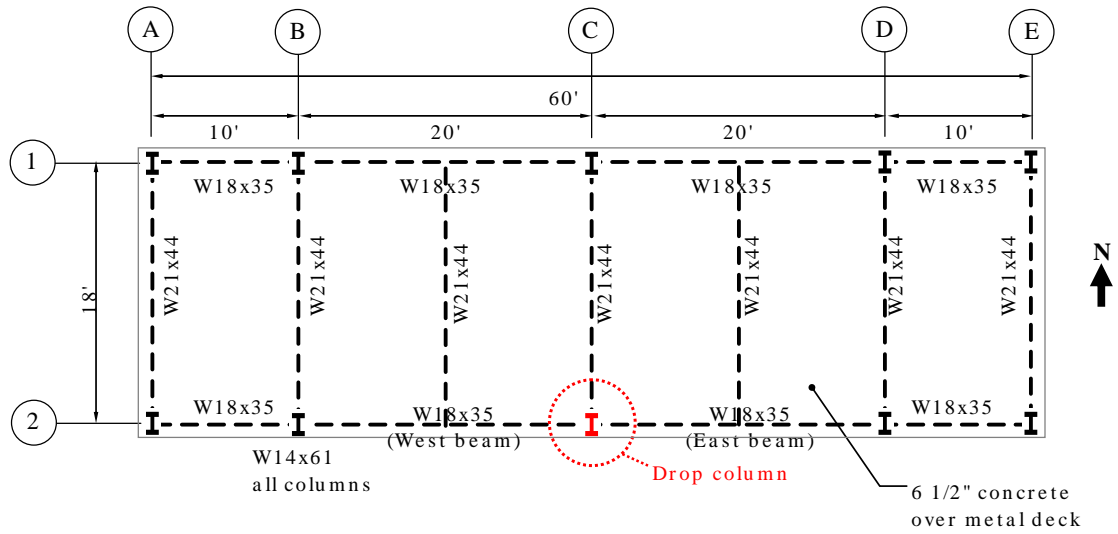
Layout of the UCB floor and location of perimeter column removal
